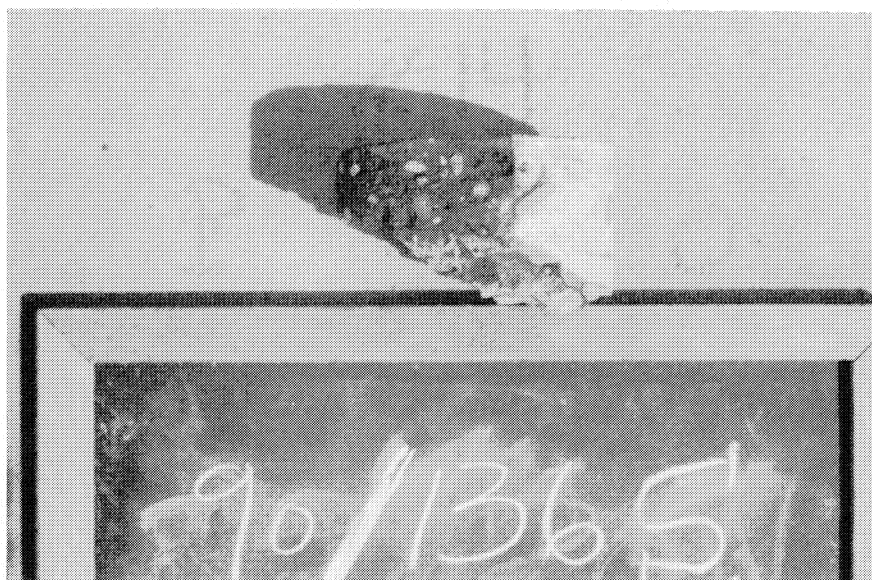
Concrete Delamination (Half Patch, Half Original)
